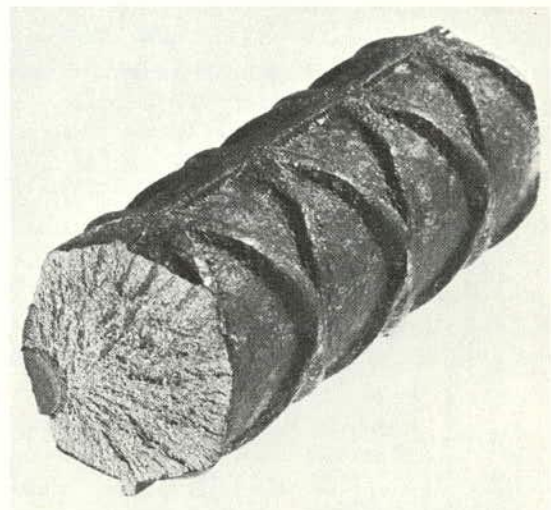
Static Tension Fracture of Previously Fatigued Test Bar
